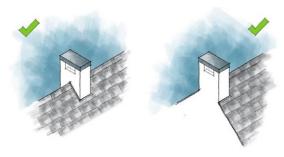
Placement of chimney stack through roof ridge or flush with gable wall, visually integrates with the overall appearance of a house, adding more substance and presence.
